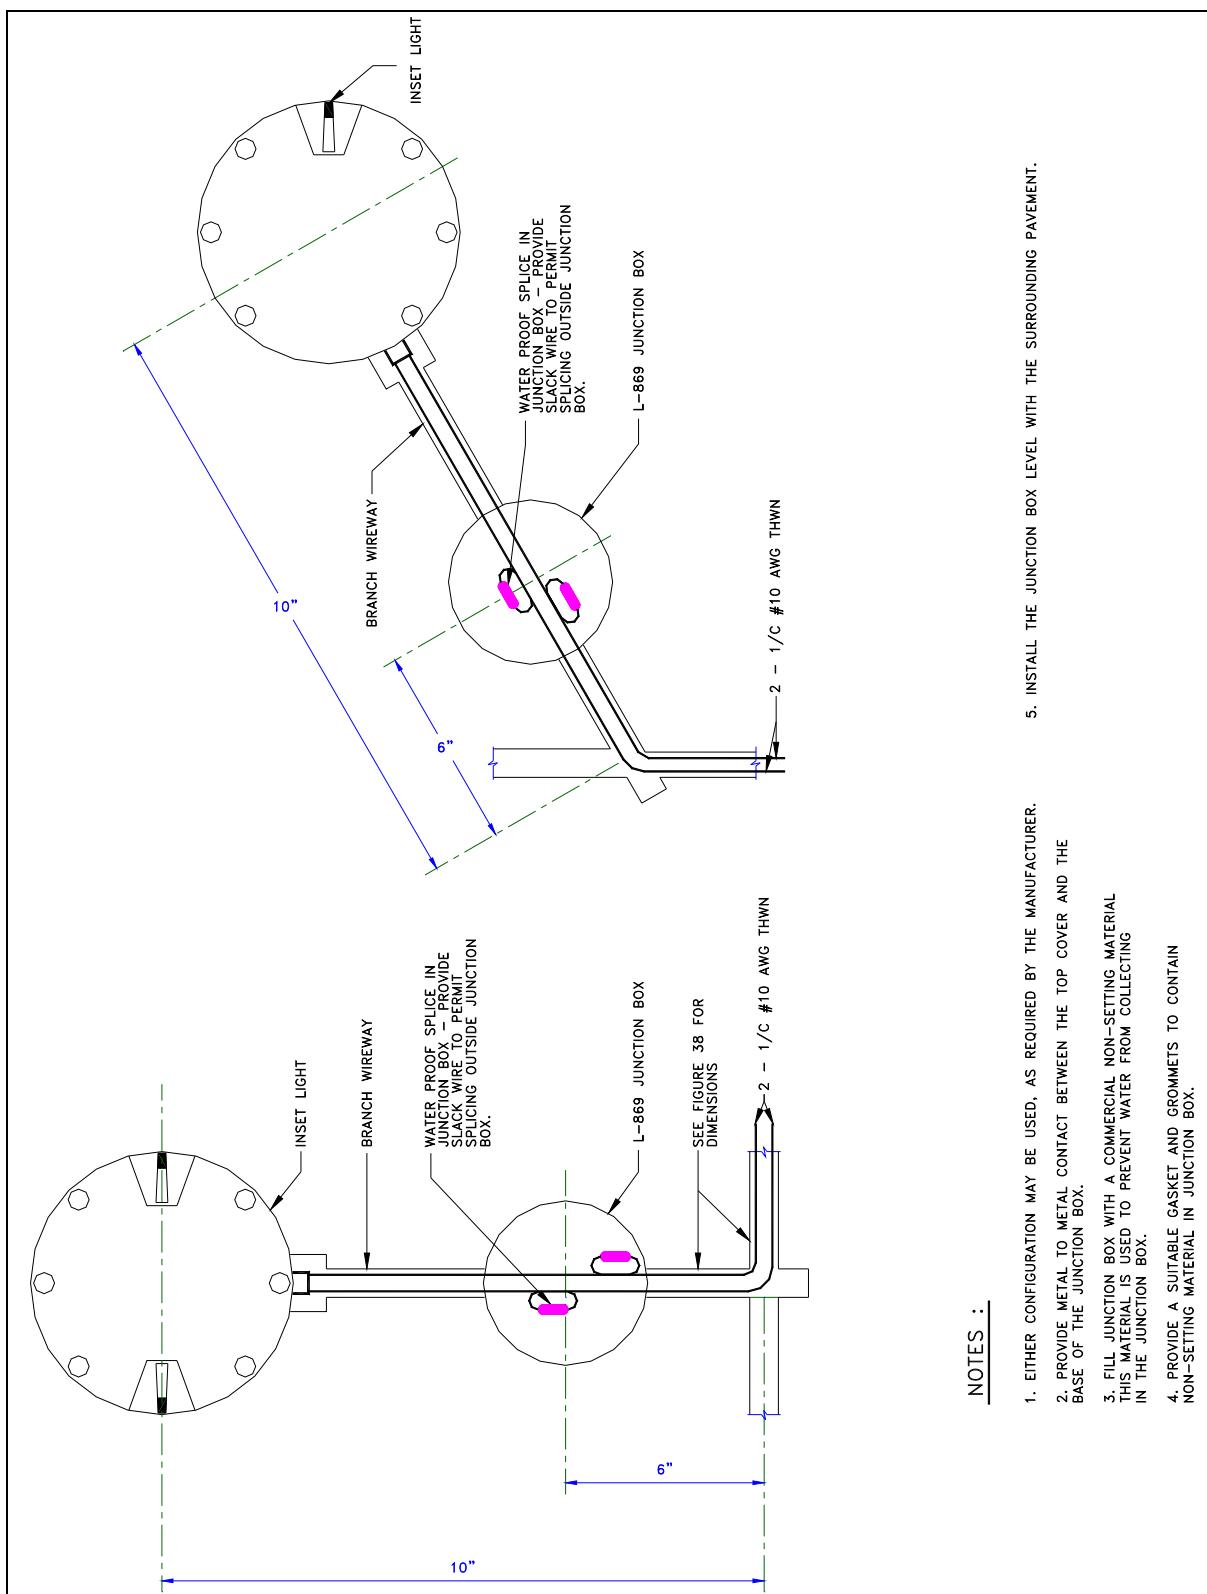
Typical Equipment Layout, Inset Type Lighting Fixtures.
